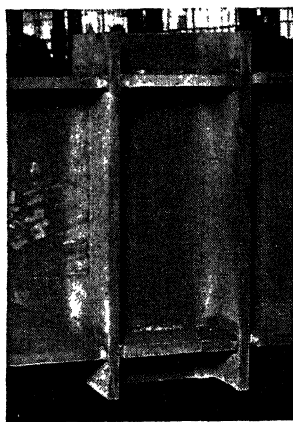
Welded beam to column connections in specimen prior to test.
